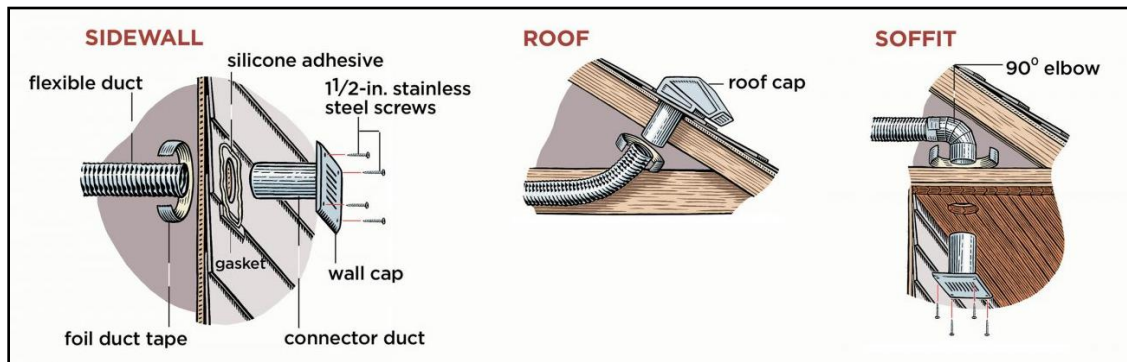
Vent Cap Orientation for Soffit, Wall-Mounted, and Roof (Truini, 2016)
